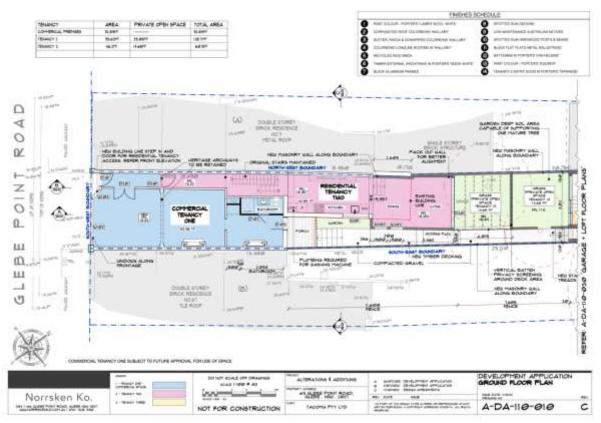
Proposed layout of ground floor including front shop, residential tenancy and the garage fronting Campbell Lane
